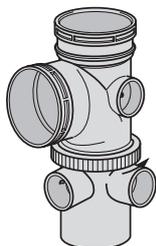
104.412.92 Variable Boss Branch (spigot outlet) – slackening locking rings
